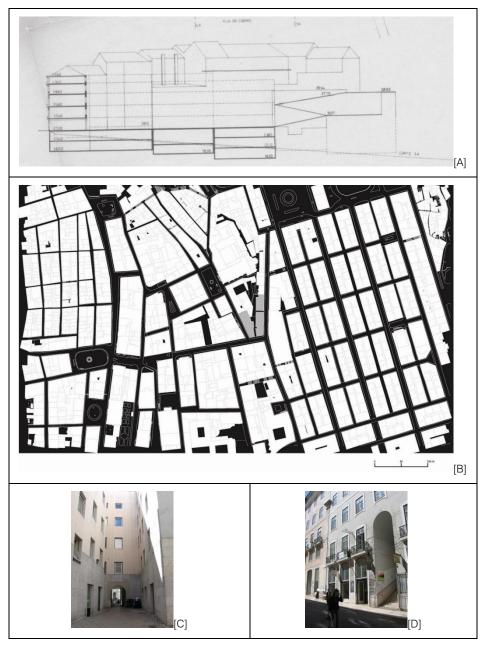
Bloco B; [A] section between Garrett street and access to Carmo (Castanheira and Santos, 1988); [B] location plan: public space(black), case-study (grey); [C]view of the "corridor"; [D] view façade Carmo St
